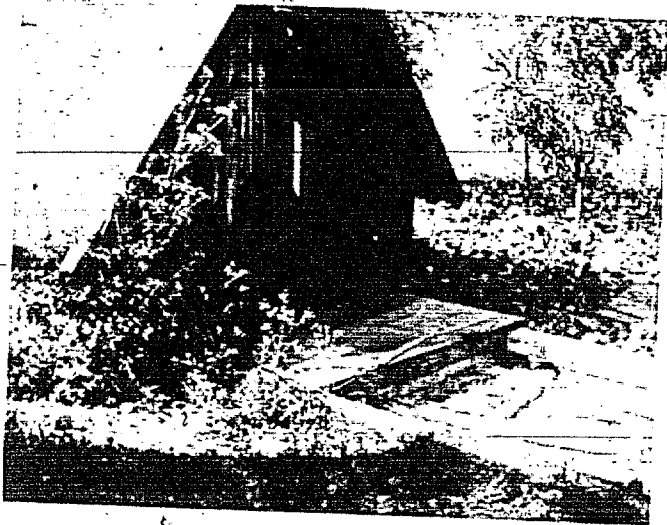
Photograph showing view at rear of Exhibit 14 showing track for steel entrance door to underground pump room.
